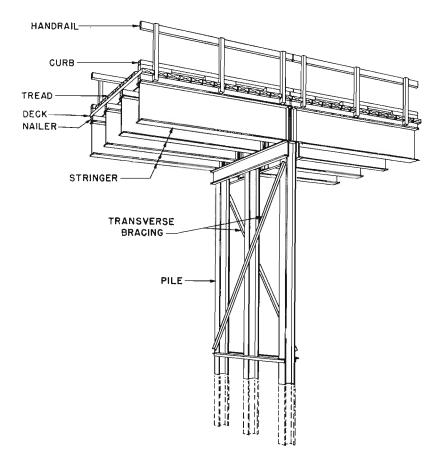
Highway bridge, class 50, single-lane, steel stringers on steel pile bent.
